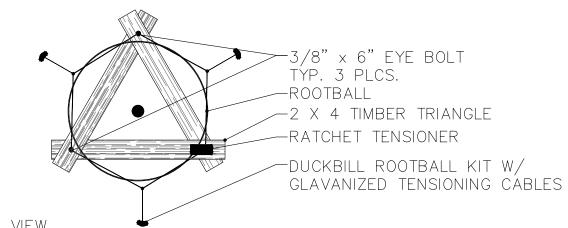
LANDSCAPE NOTES, DETAILS-LS2
